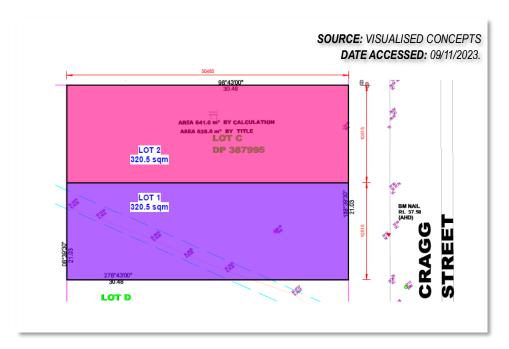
PROPOSED SUBDIVISON LAYOUT OF THE SITE
